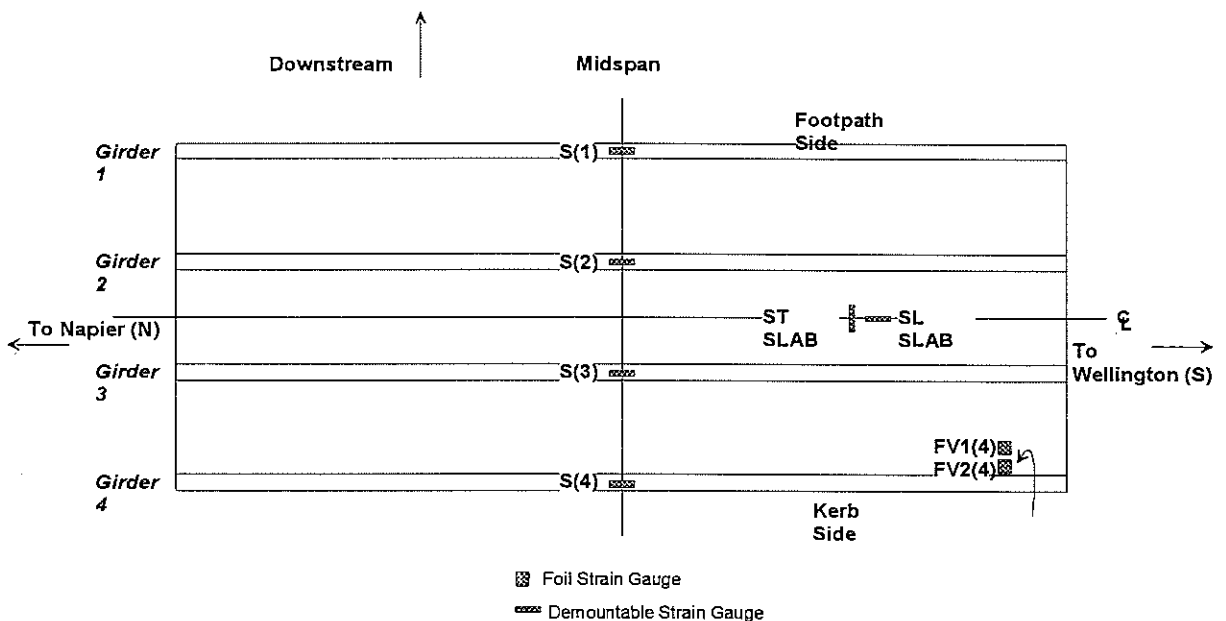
Instrumentation plan for the Waipawa Bridge.
